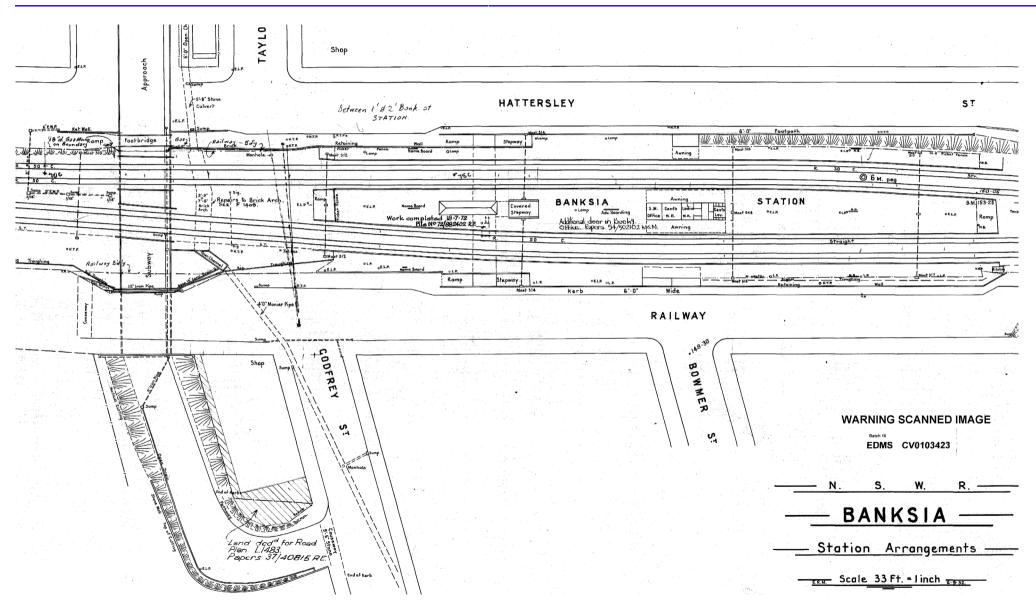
Banksia Station arrangement, c.1932 (Source: Sydney Trains plan room)
